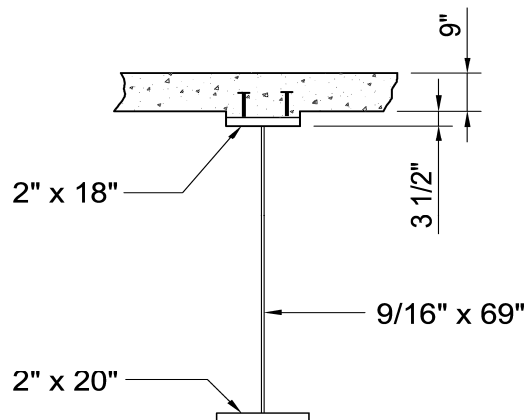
Example Composite Cross-Section – Exterior Girder – Negative Flexure Region
